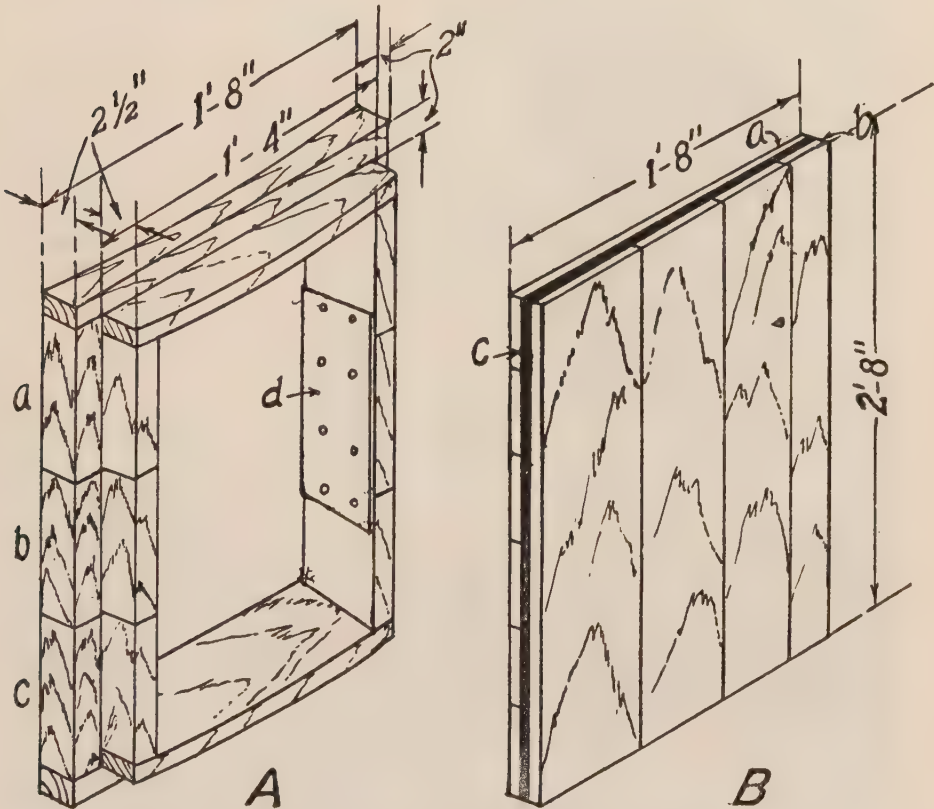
(A)—Door form: (a) (b) (c) three divisions of the form; (d) A board holding a, b and c together.
